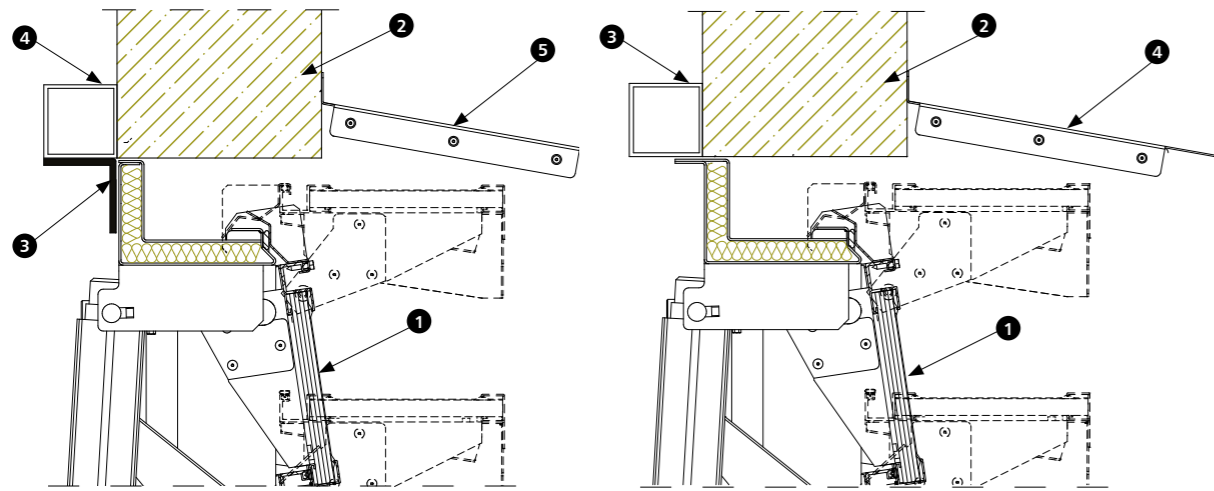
Installation of louvered vent in a wall (façade) using additional steel section
